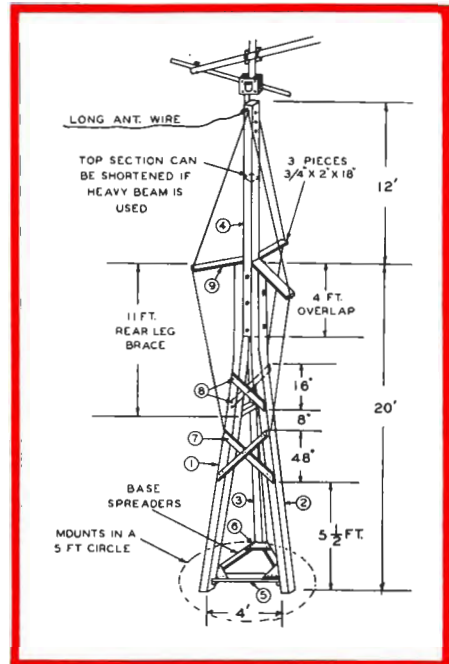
ASSEMBLY DRAWING for the tower. Dimensions of all wood parts are given in TABLE I.
